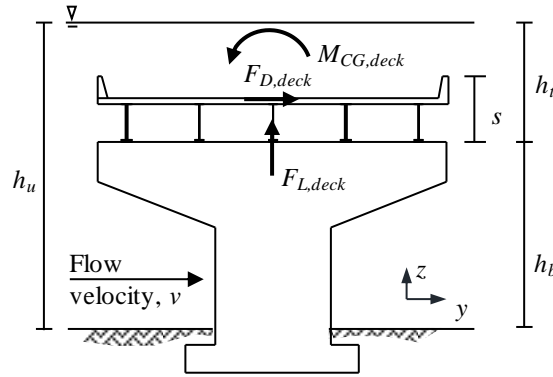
Hydraulic drag, lift, and overturning moment when the bridge deck is submerged.
